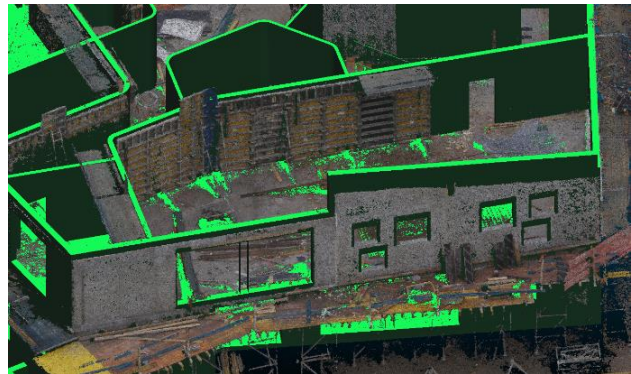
Point cloud of a finished, plain wall and formwork overlaid with the corresponding 3D geometry
